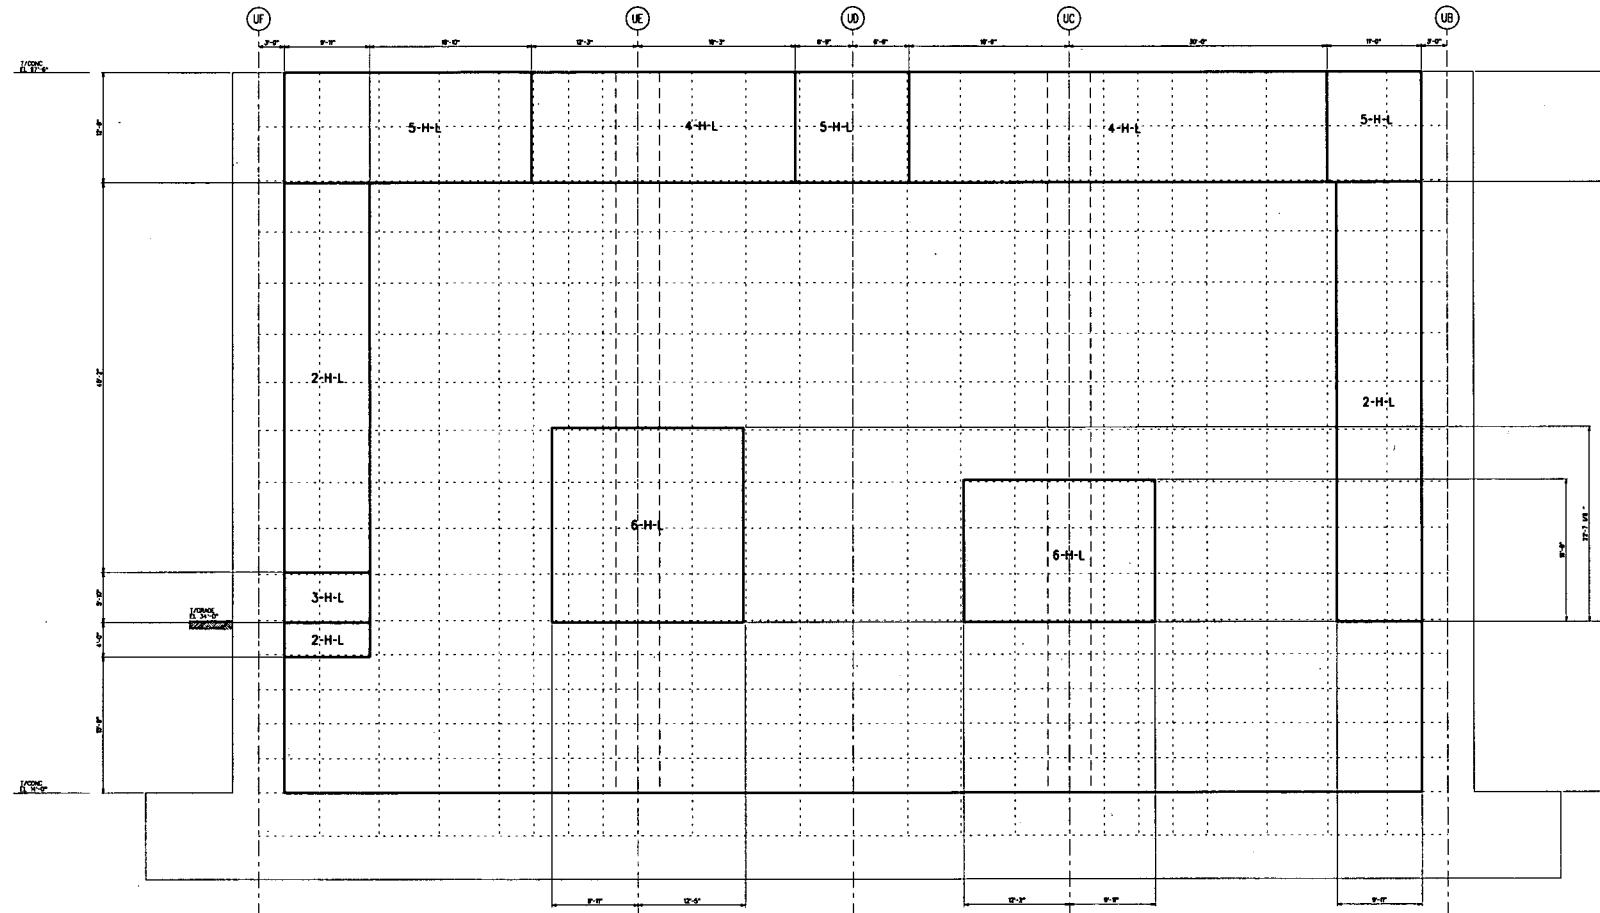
BASIN EAST WALL LOOKING WEST
